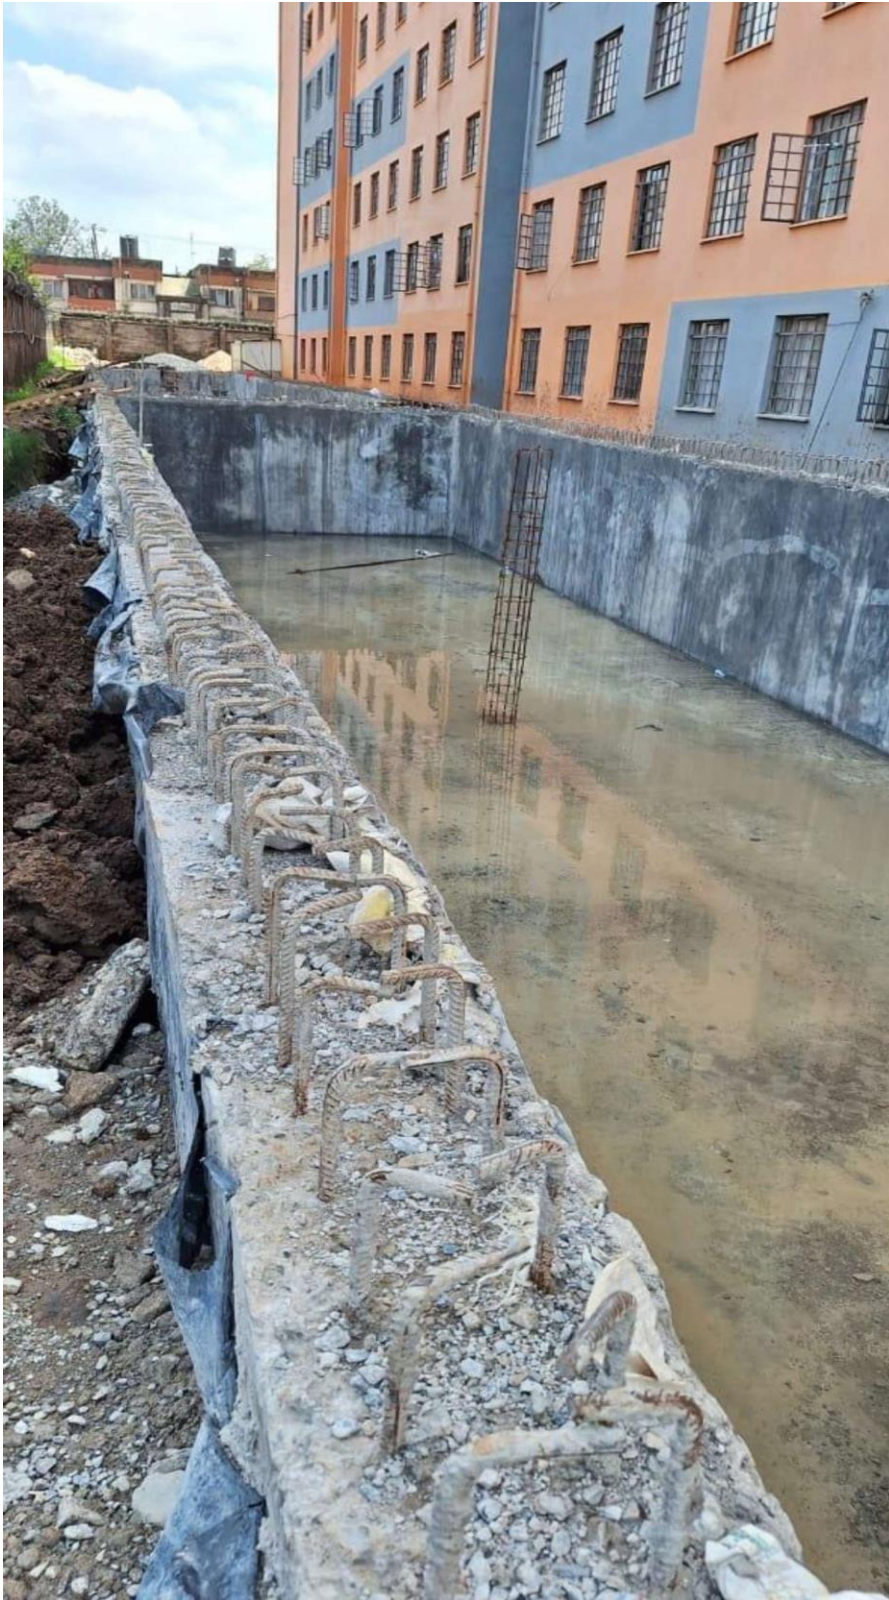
Construction of Additional 1Million Litres Underground Water Tanks at Park Road Affordable Housing Scheme
